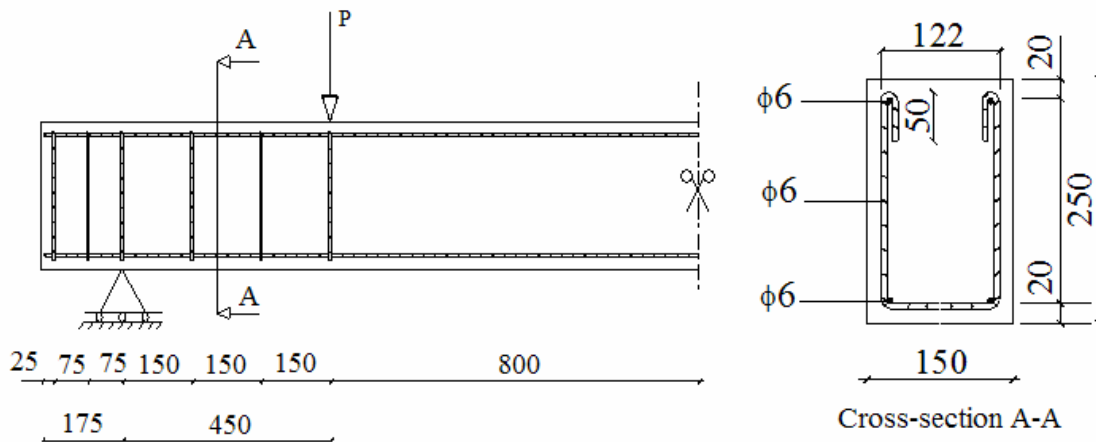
Geometry and reinforcement layout of beams designed for moment failure.
